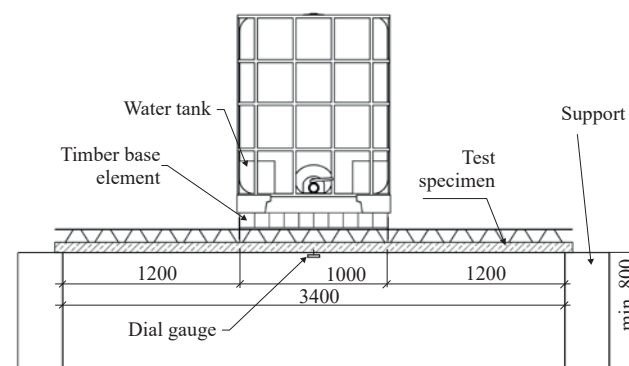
Field stand for testing structural stay-in-place formwork panels
